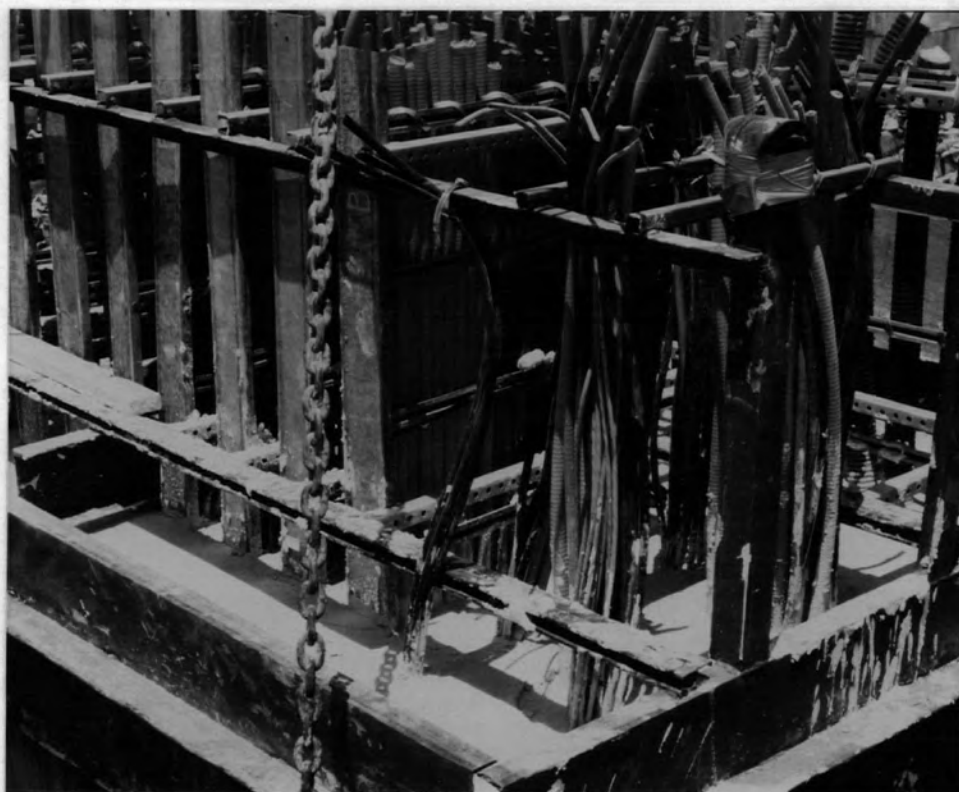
OVERALL VIEW OF TEST SLAB PLACED ONTO FURNACE
